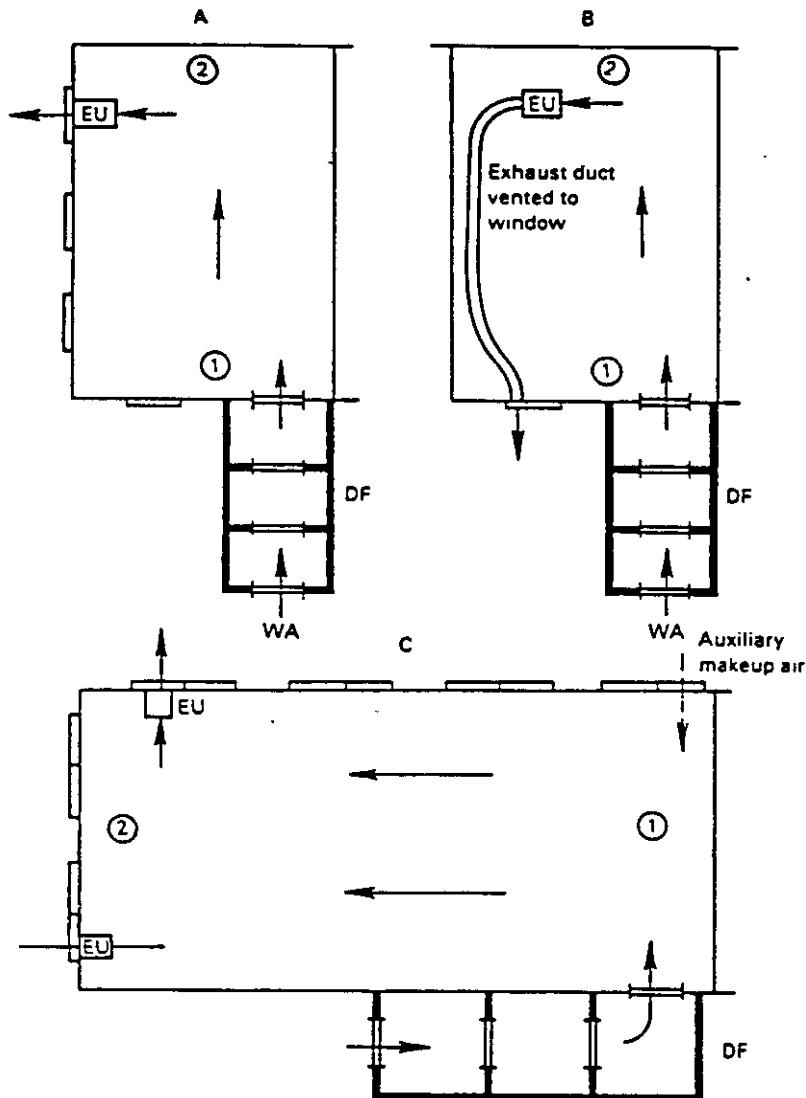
Examples of negative pressure systems. DF, Decontamination Facility; EU, Exhaust Unit; WA, Worker Access; A, Single-room work area with multiple windows; B, Single-room work area with single window near entrance; C, Large single-room work area with windows and auxiliary makeup air source (dotted arrow). Arrows denote direction of air flow. Circled numbers indicate progression of removal sequence.
